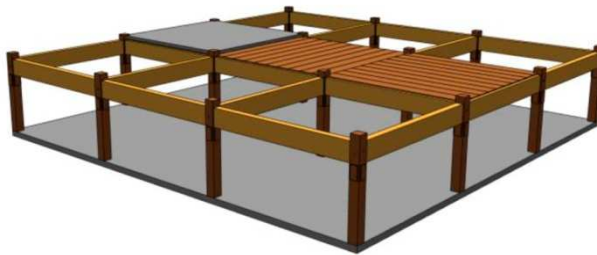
Visualization of the first timber storey of the ETH House of natural Resources. Post-tensioned timber frames made of ash and composite floor of beech-LVL and concrete (156).
